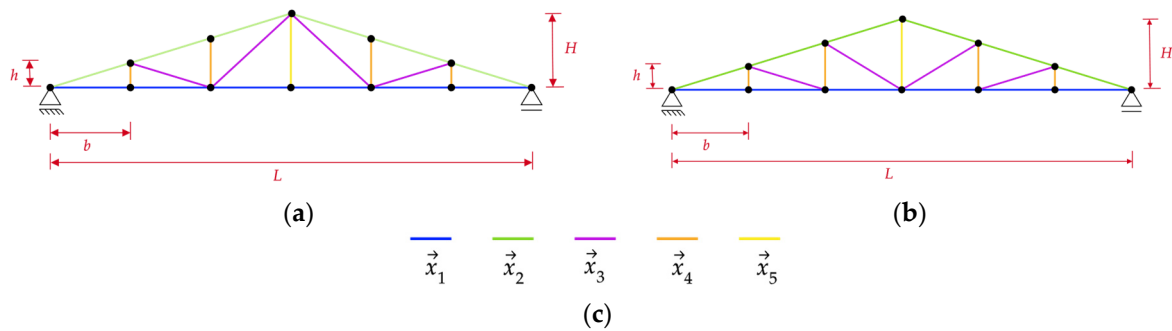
Trusses and their design variables: (a) modified Fan truss, (b) Howe truss, and (c) design variables.
